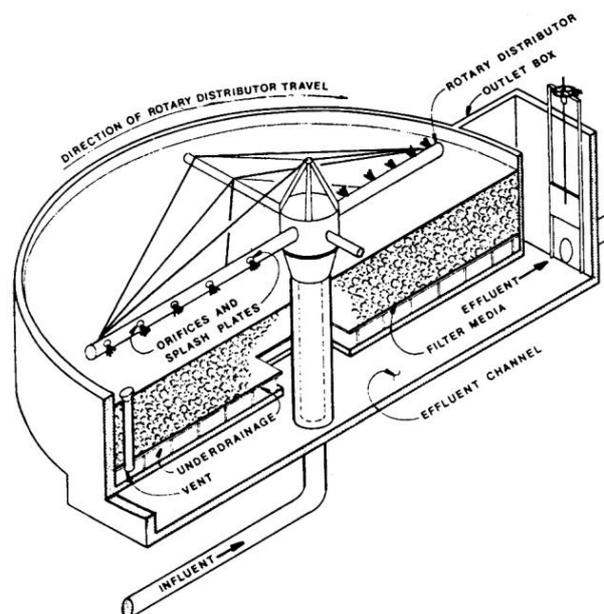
Cross-section of typical trickling filtration equipment. (Wang et al. 2009, Figure 9.3)
